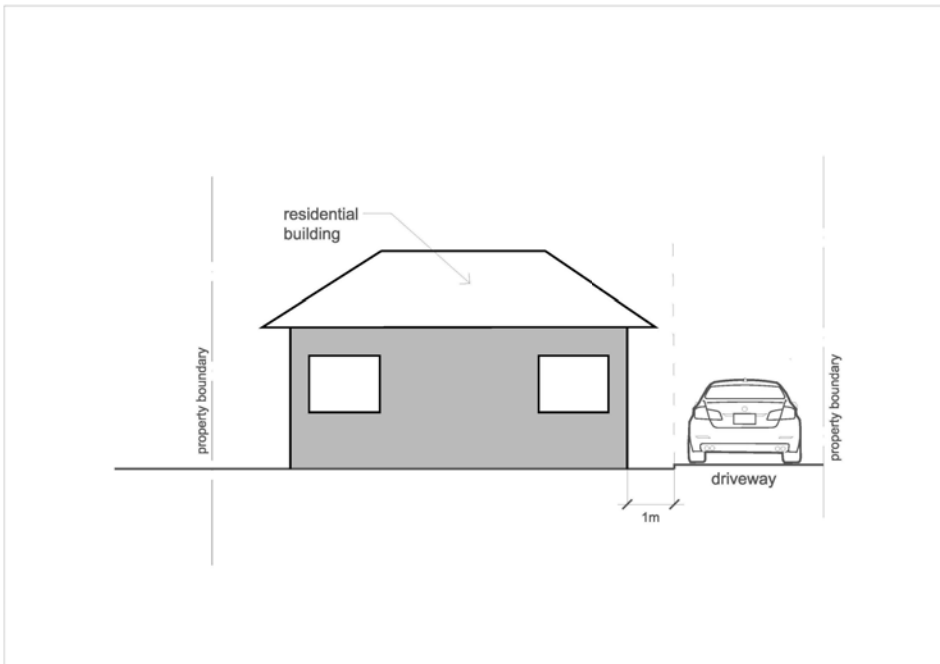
B.5 Minimum separation distance between new residential building and existing under-width driveway: possible scenarios
